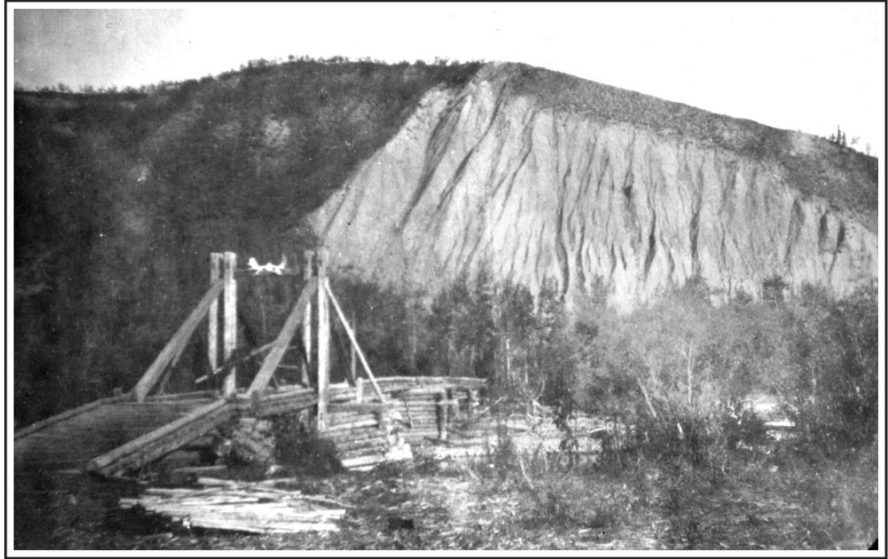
CR&NW trestle bridge 147B at Mile 147, 1957. The Kuskulana Bridge (VAL-207) is in the background. Photo courtesy of the ADOT&PF Bridge Section, Juneau.
